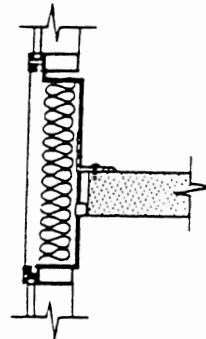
Curtain Wall Air Barrier (Perreault)
